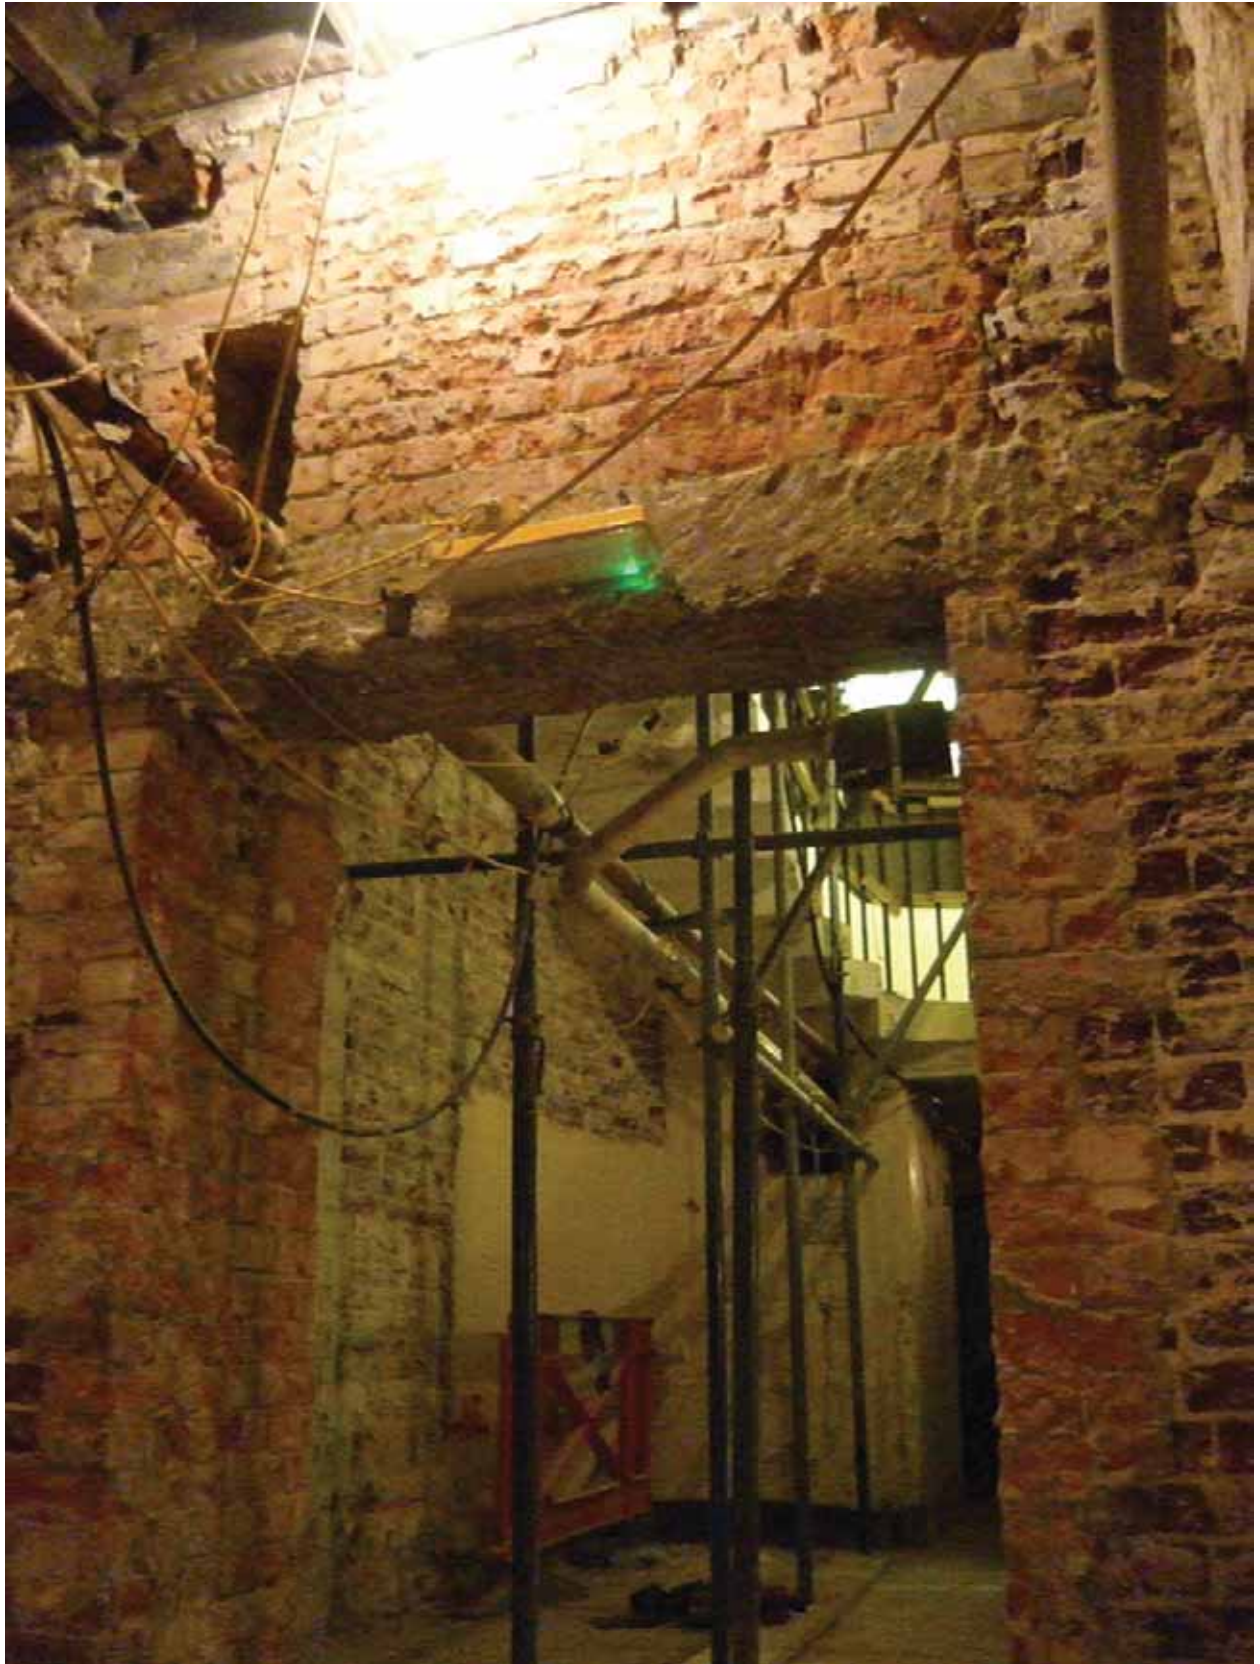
North wall of Corridor 1A, looking north-west into Stairs 01 (EAF10 BDH6(58))
